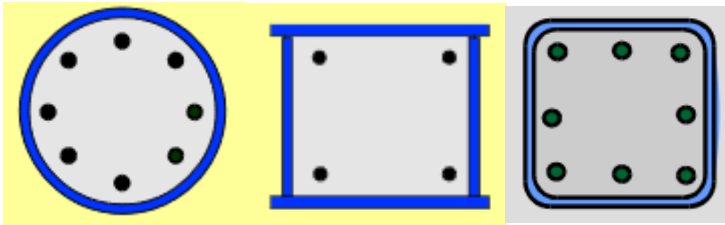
Concrete filled section with reinforcement. ( Source: G. Hansville: Eurocode 4 composite columns. [14].)
